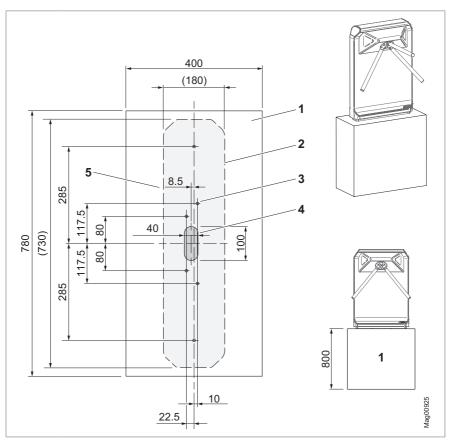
mTripod FMTP-MS foundation and empty conduit plan (dimensions in mm)
